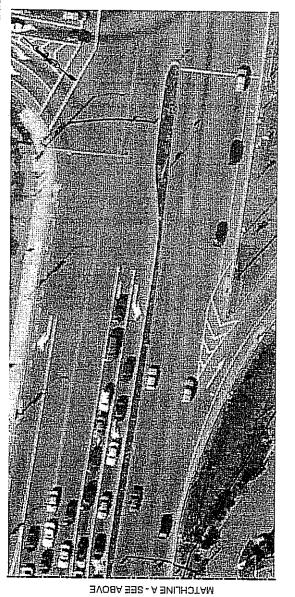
Conceptual Striping Plan (Sheet 1)
